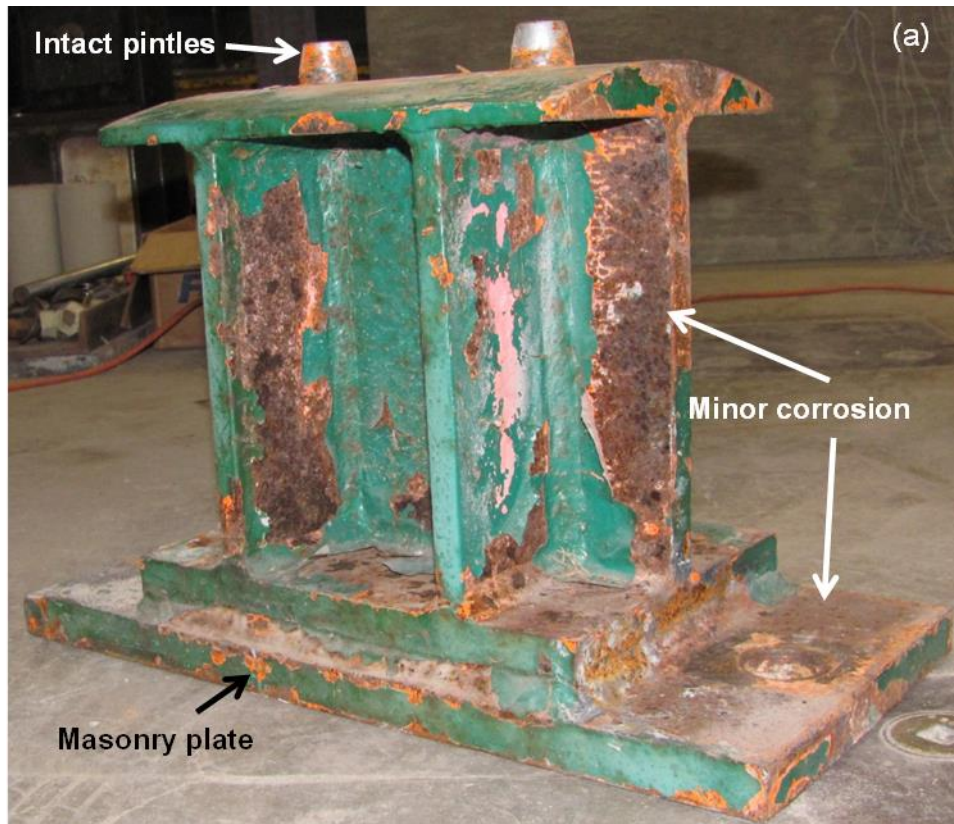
Pier bolster bearing #15 (PB15) in the as-received condition
